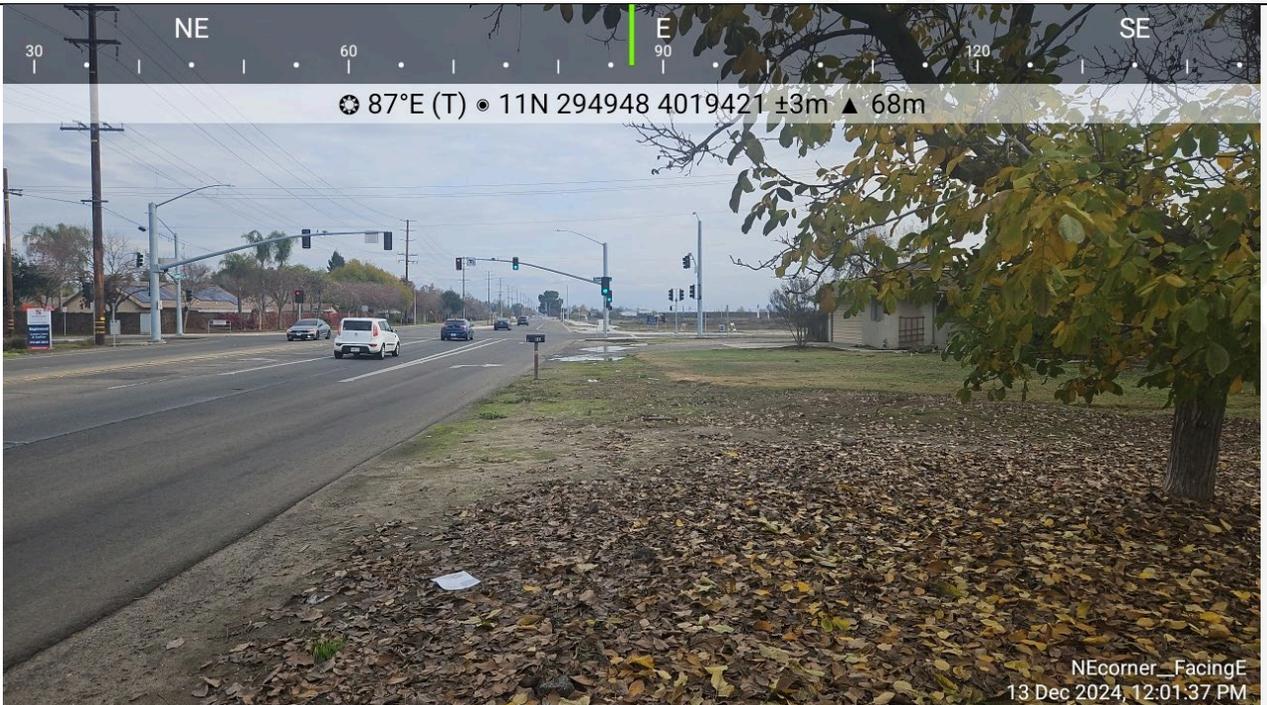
View of site conditions and residence on the northeast boundary of the project area facing east.
